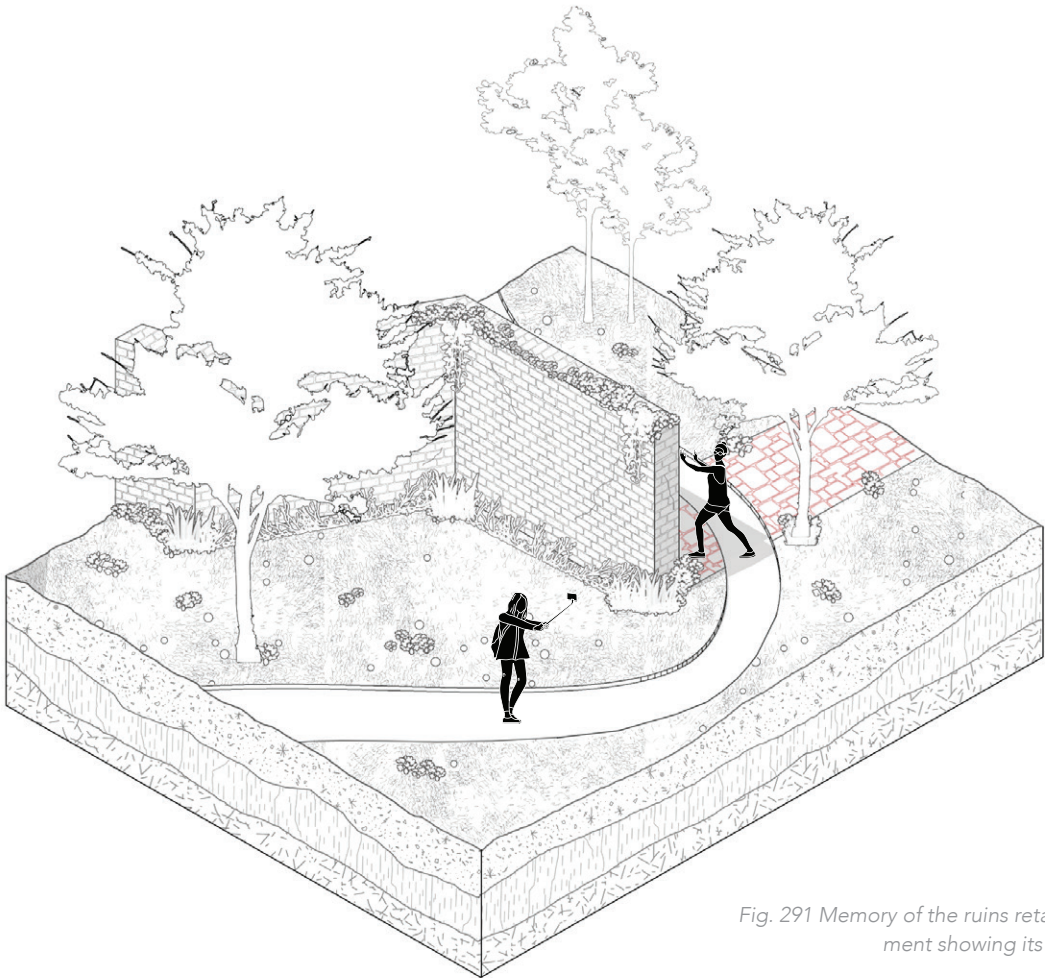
Memory of the ruins retained via pavement showing its plan © Author
